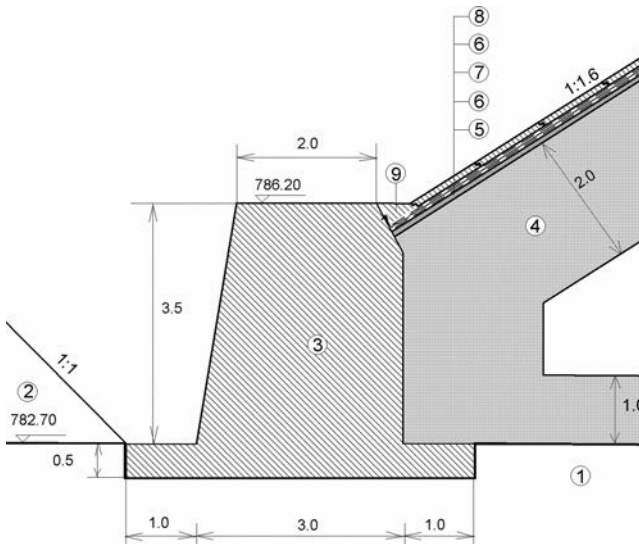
Connection of the geosynthetic lining with the reinforced concrete plinth. (1) Rock foundation; (2) river deposit; (3) reinforced concrete plinth; (4) filter layer; (5) lean concrete,  $d = 7 \text{ cm}$ ; (6) geotextile,  $500 \text{ gr/m}^2$ ; (7) PVC geomembrane,  $2.5 \text{ mm}$ ; (8) precast reinforced concrete slabs,  $d = 10 \text{ cm}$ ; (9) concrete plug.
